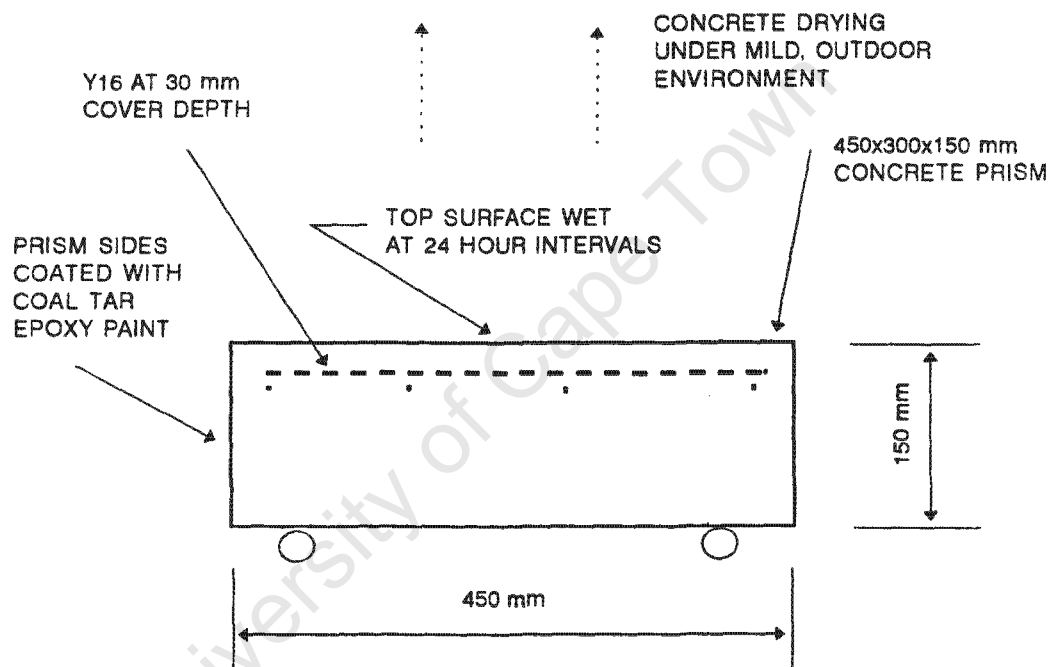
Arrangement of Concrete Blocks Used for Corrosion Investigation
